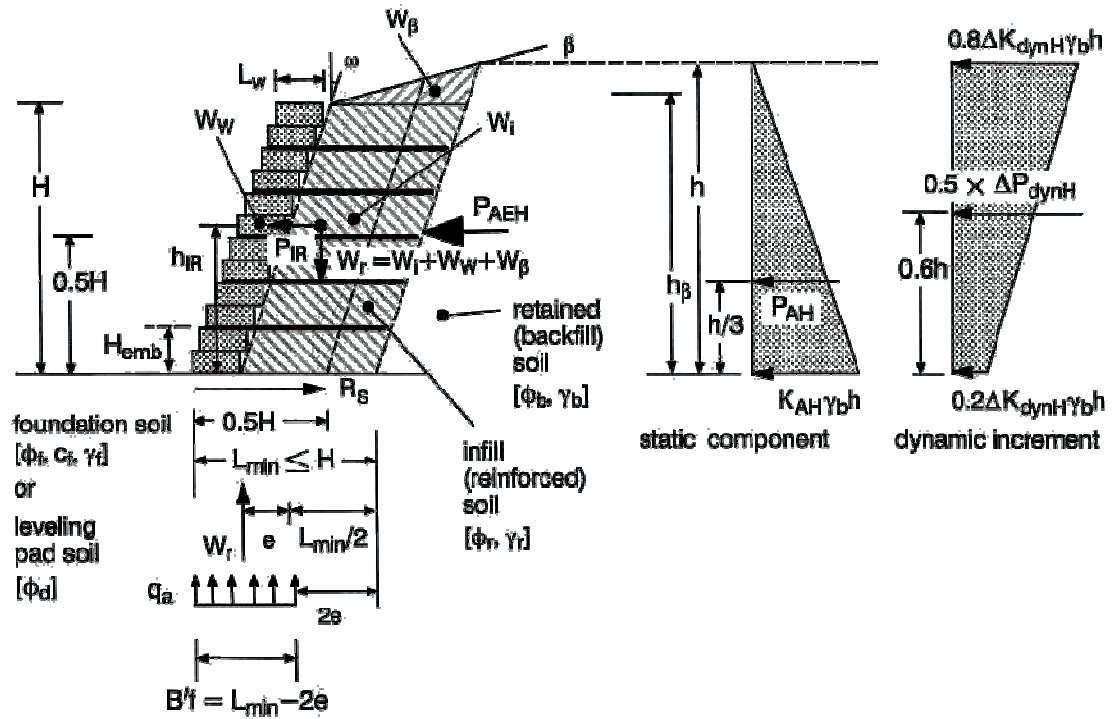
Geometry and forces in external stability calculations for reinforced SRW structures
